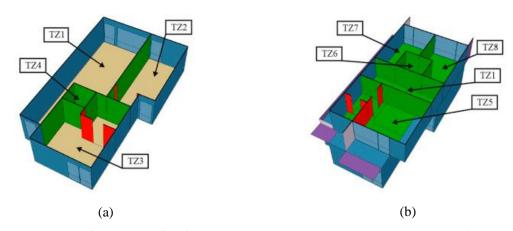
Ground floor (a) and first floor (b) levels thermal zones, where: TZ1 – Hall, living room and staircase, TZ2 – Kitchen, TZ3 – Ground floor suite bedroom, TZ4 – Ground floor bathroom, TZ5 – First floor suite bedroom, TZ6 – First floor bathroom, TZ7 – First floor single room and TZ8 – First floor single room
